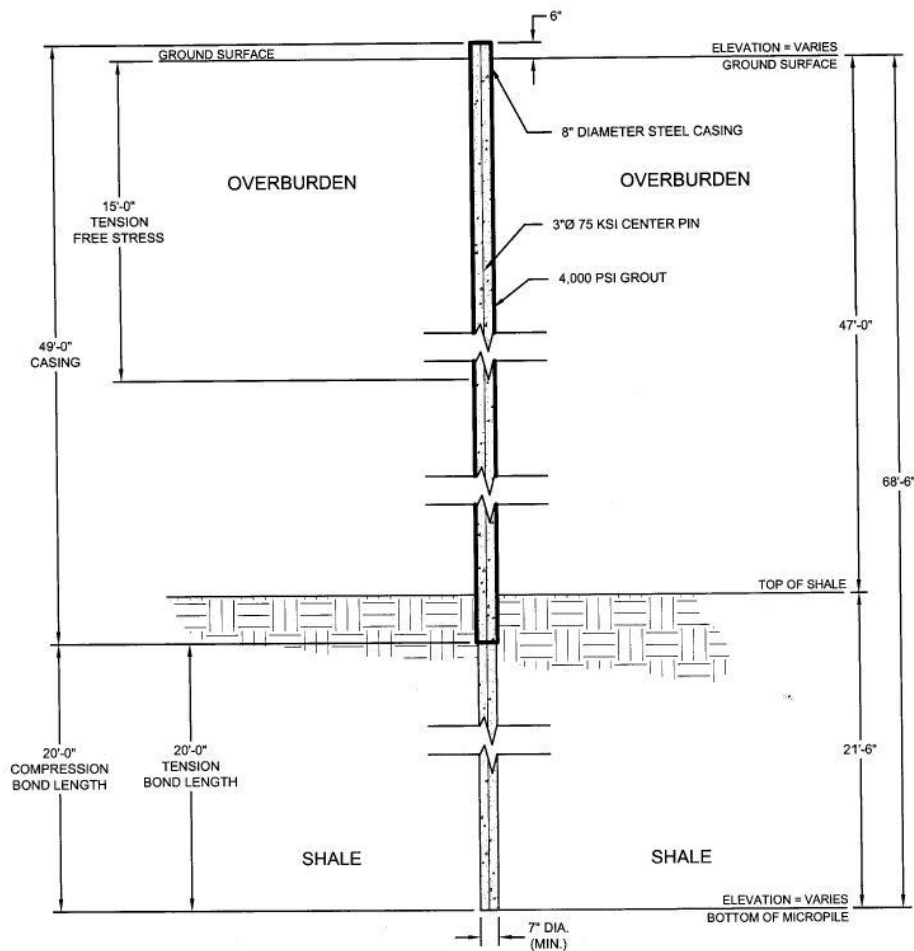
Final design for the end abutment that consisted of steel casing down to bedrock.
